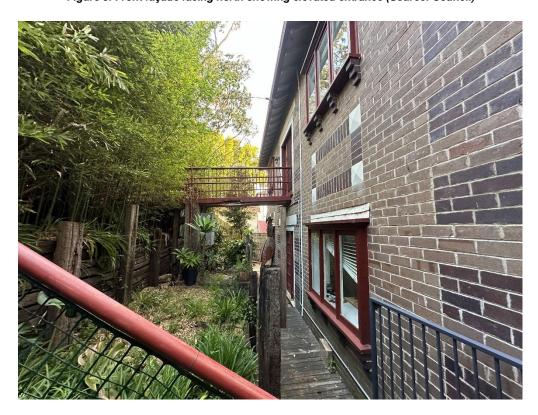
Front façade facing south showing elevated entrance (Source: Council)
